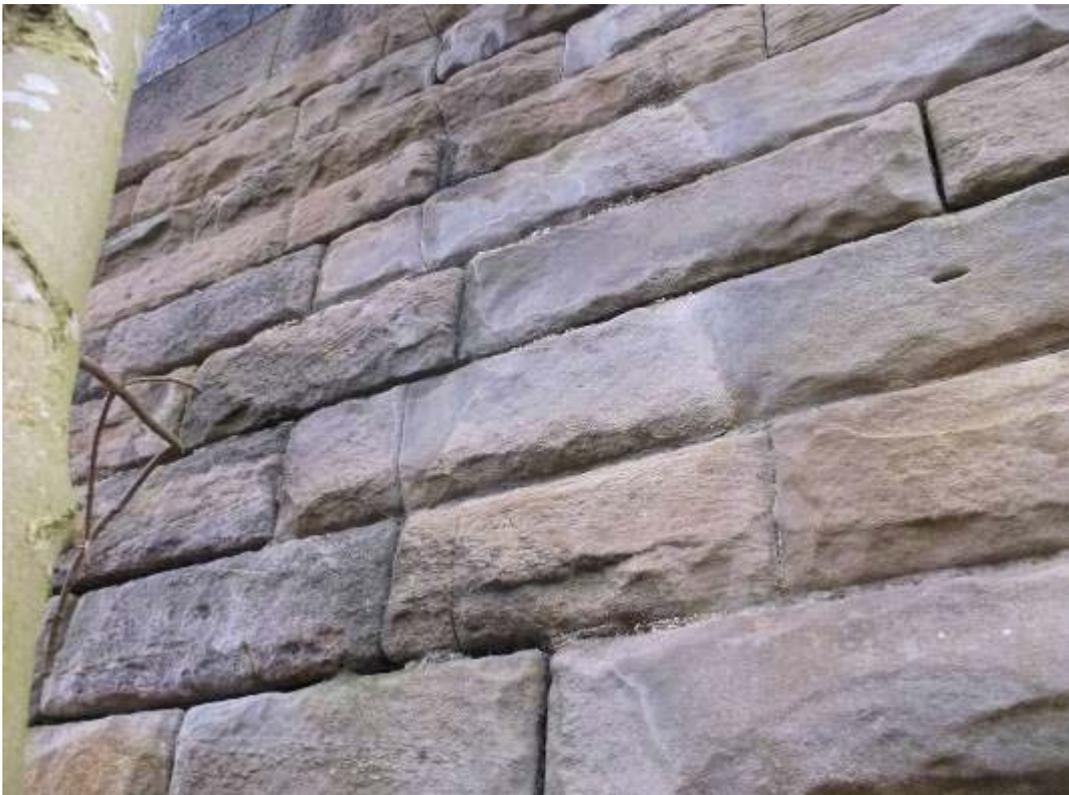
Tree adjacent to north west elevation of pier 3
